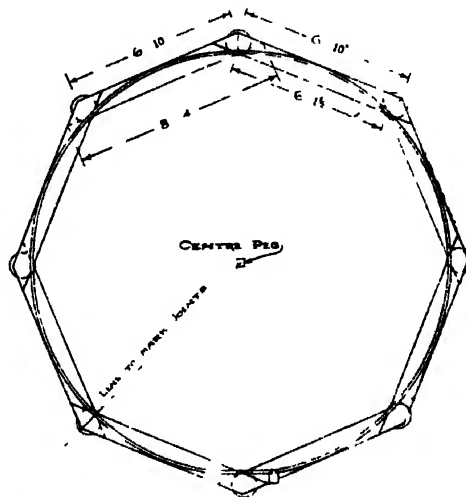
Foundation plan of Stave Silo, showing lay-out of kerbing timbers.
